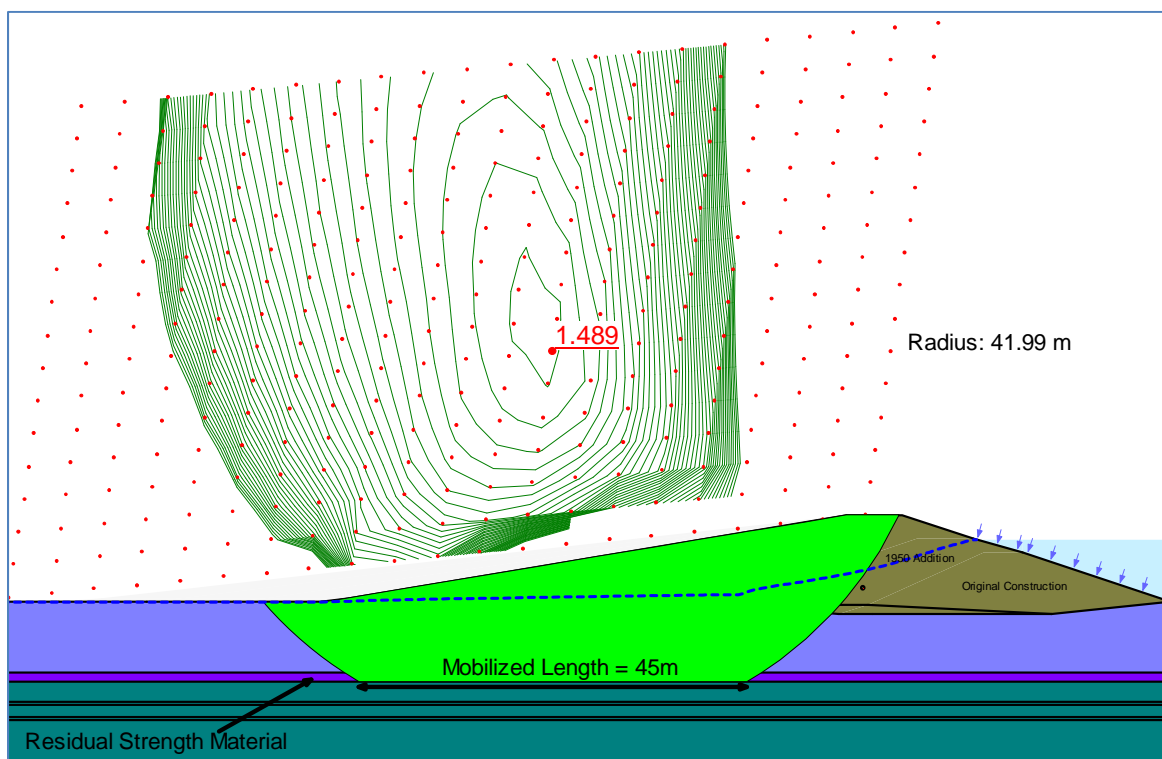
Slip Surface Detail of Dam Height of 727.1 masl (6:1 Slope)
